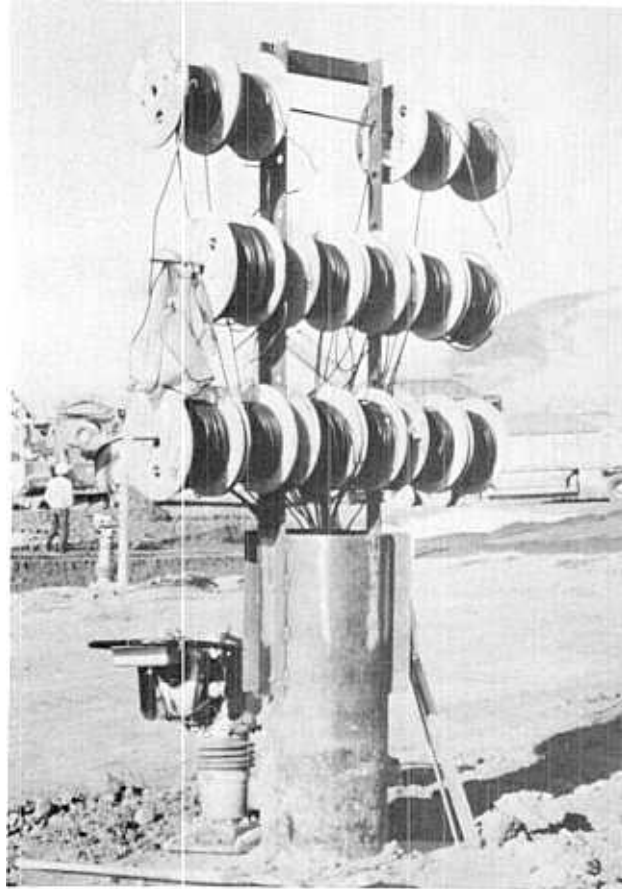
Riser pipe used for installation of vertical piezometer tubing in an embankment. P801-D-81009.
